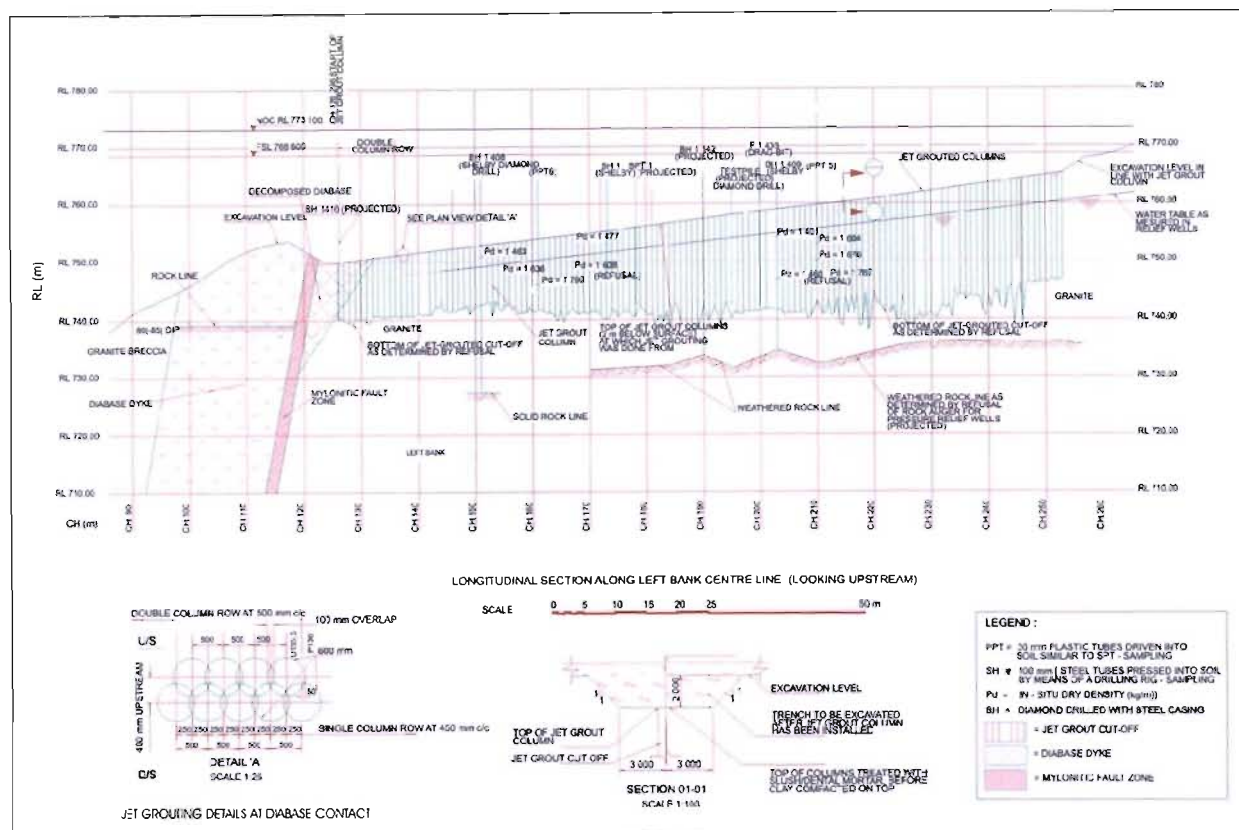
Longitudinal section along jet grout curtain showing depth of columns and column layout details.
